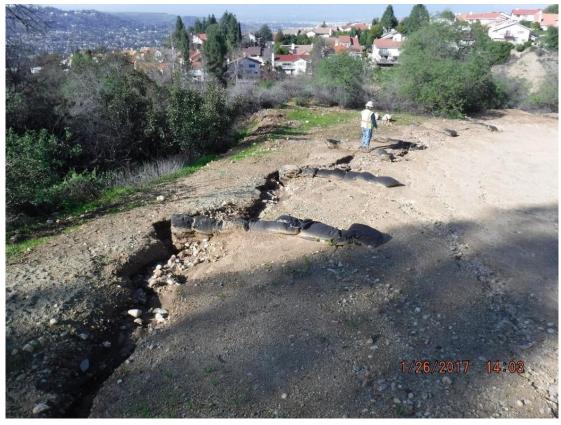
Erosion of acess road at Tower 49-T2, Segment 8 Overhead. Photo courtesy of SCE.
